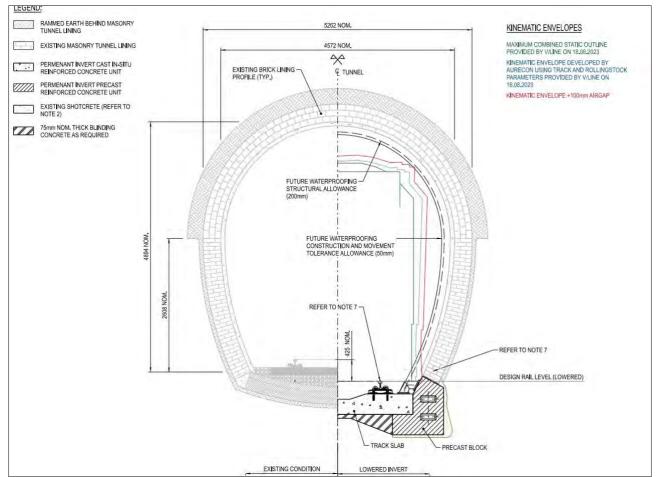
TYPICAL CROSS SECTION SHOWING EXISTING PROFILE (LHS) AND PROPOSED MINIMUM INTERNAL PROFILE REQUIREMENTS (RHS). (SOURCE: AURECON/VLINE)
